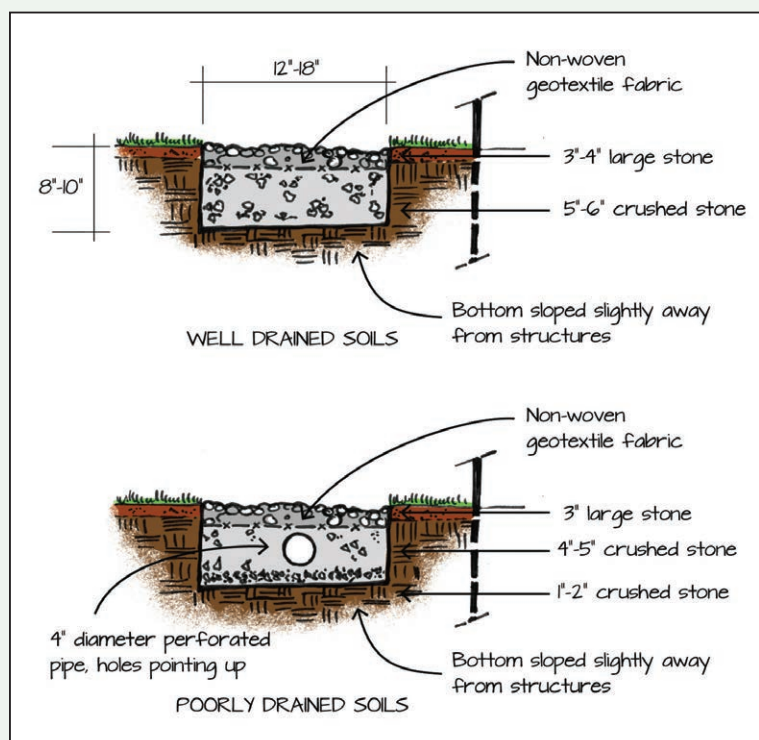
Infiltration trenches can be installed to catch roof runoff, as well as parking lot drainage. They typically do not incorporate vegetation which can lessen maintenance.
